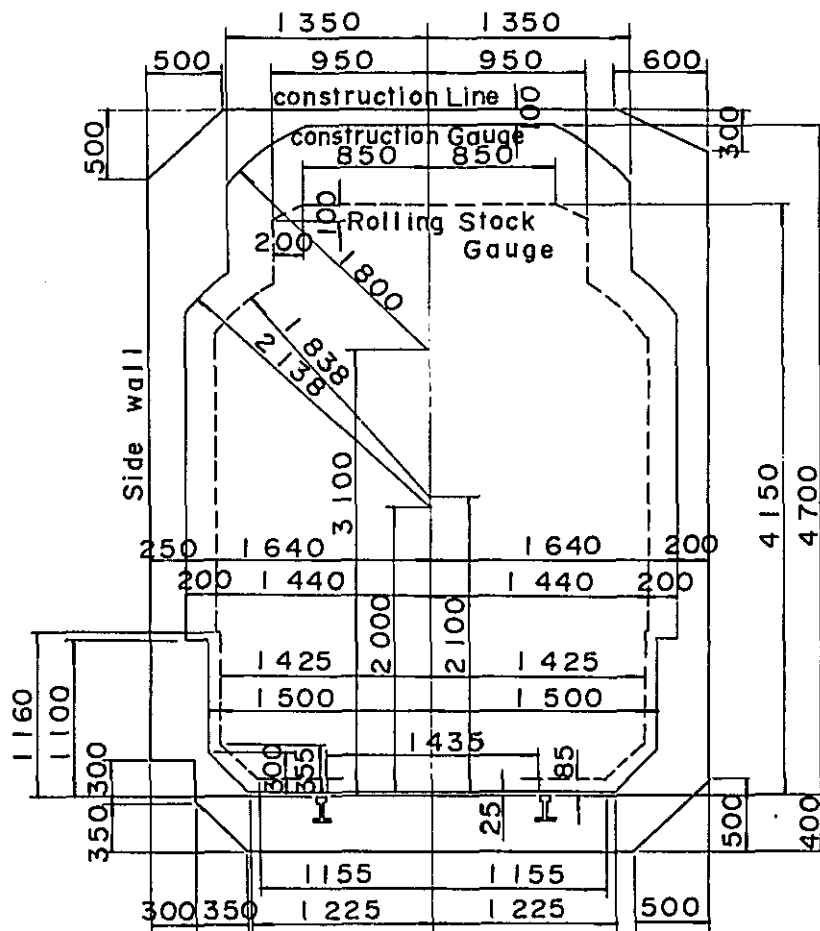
Construction Gauge and Rolling Stock Gauge.
